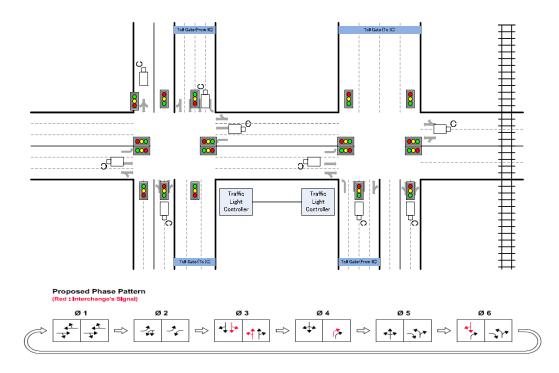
EQUIPMENT ARRANGEMENT PLAN FOR BICUTAN INTERSECTION
